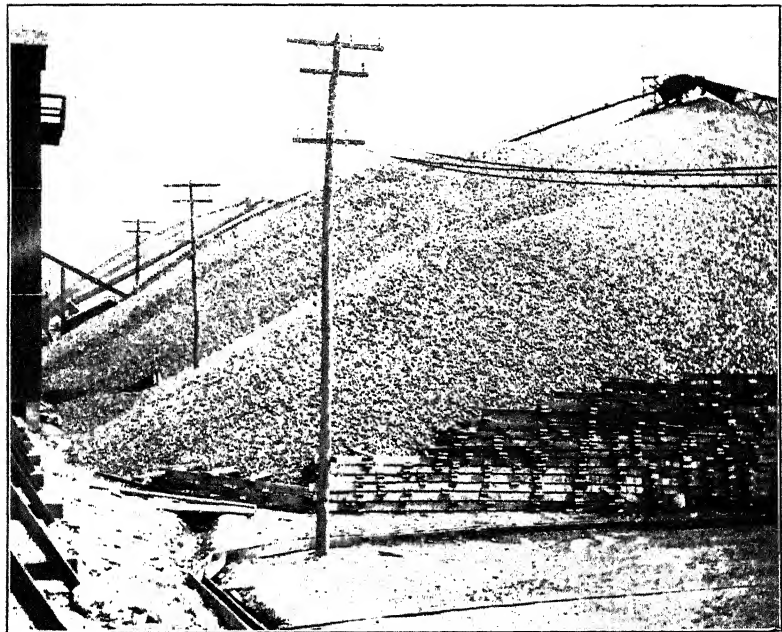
HAUTO PLANT. TEMPORARY PLANK-BULKHEAD FOR RETAINING PILED ANTHRACITE.
